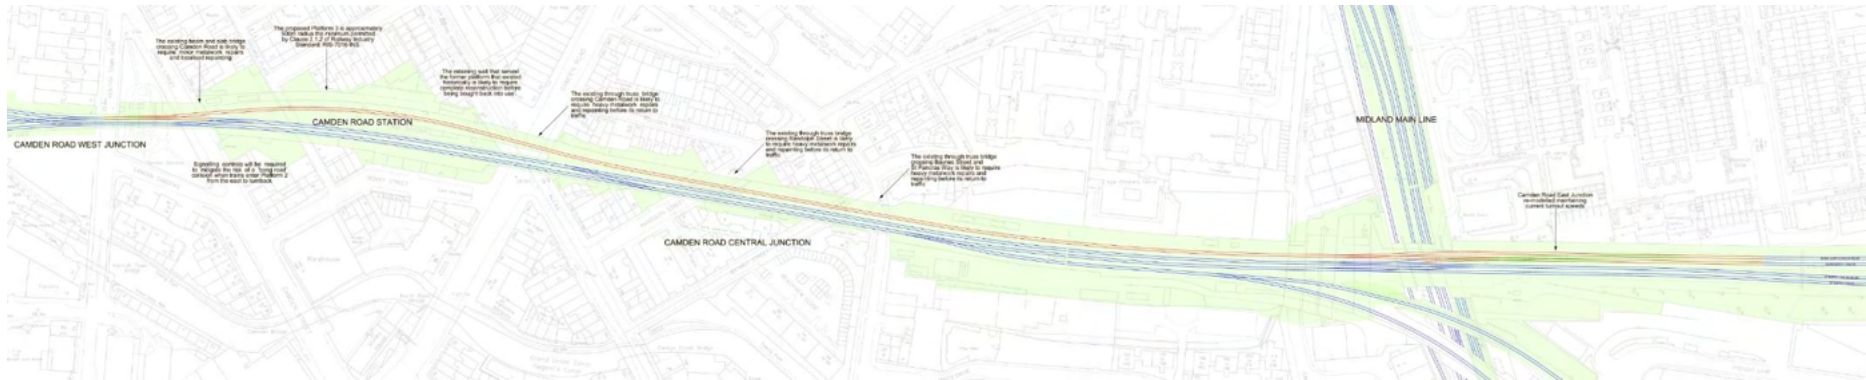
Detail from conceptual design sketch of proposed Camden Road Platform 3 scheme (see Appendix A for full sketch)
